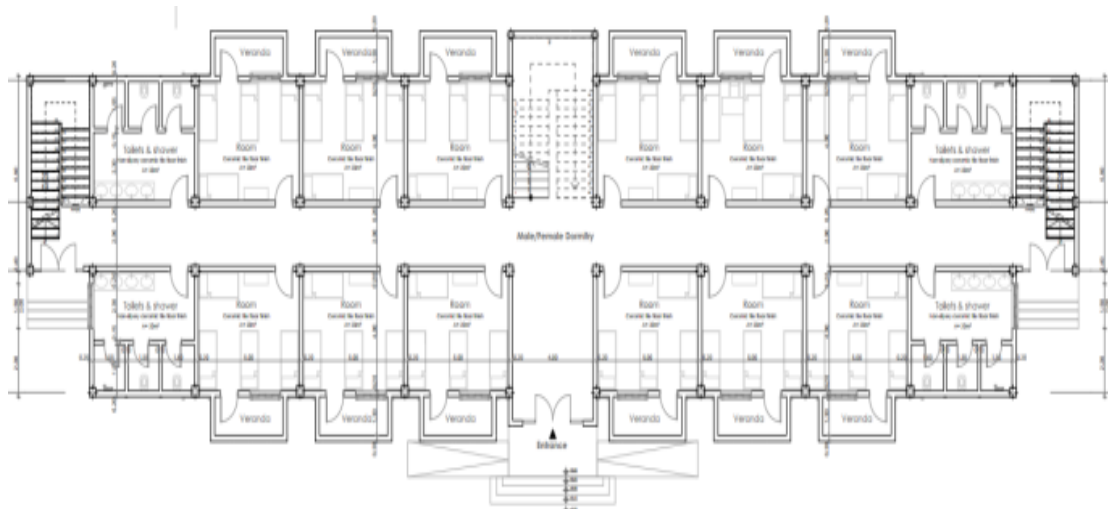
Lot 5 Floor Plan (Girls' Dormitory)
